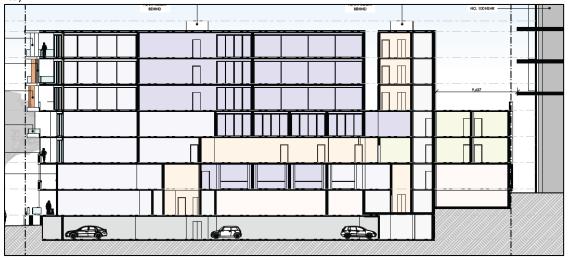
Proposed section C with Mona Road on left. (Source: PTI Architecture Pty Ltd)
